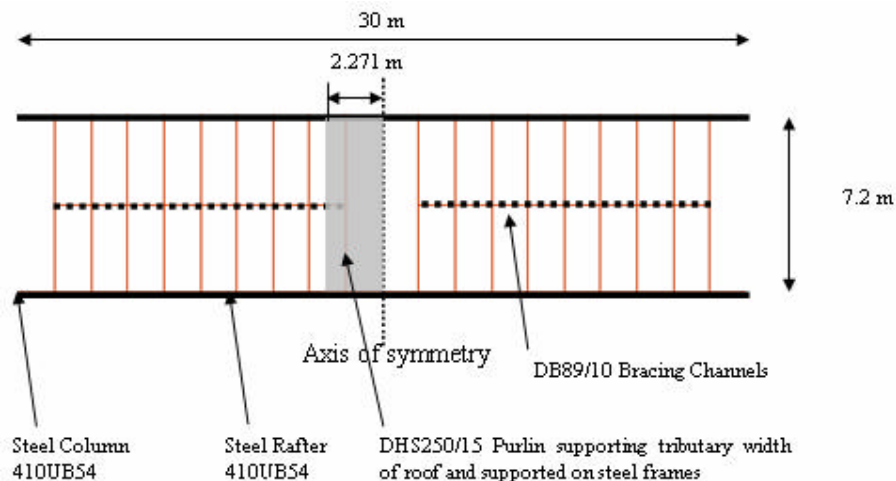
Plan view of industrial building showing the tributary area of the purlin
